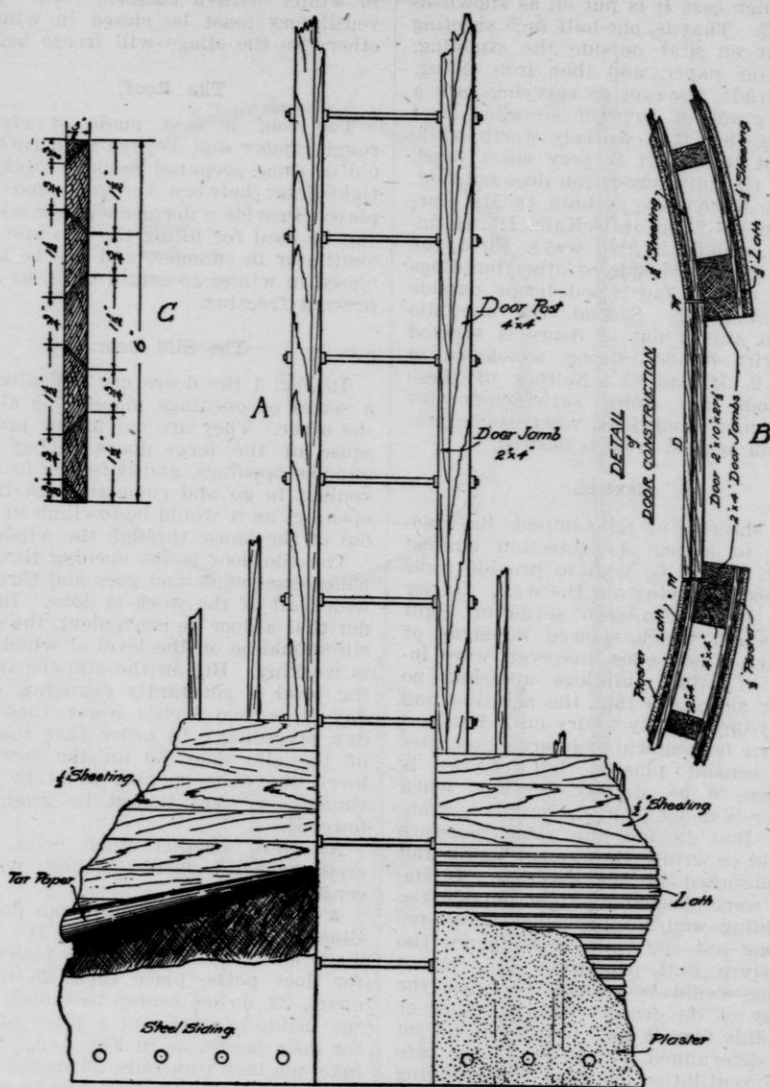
A shows door frame in place. To the right of door the outer finish is cement plaster; to the left is steel siding. The small round holes on either side of the door are the holes left between each pair of studs for ventilation, to dry out the wall. C illustrates the manner of ripping a piece of sheeting into Gurler lath, making 5 pieces of lath from one board.
